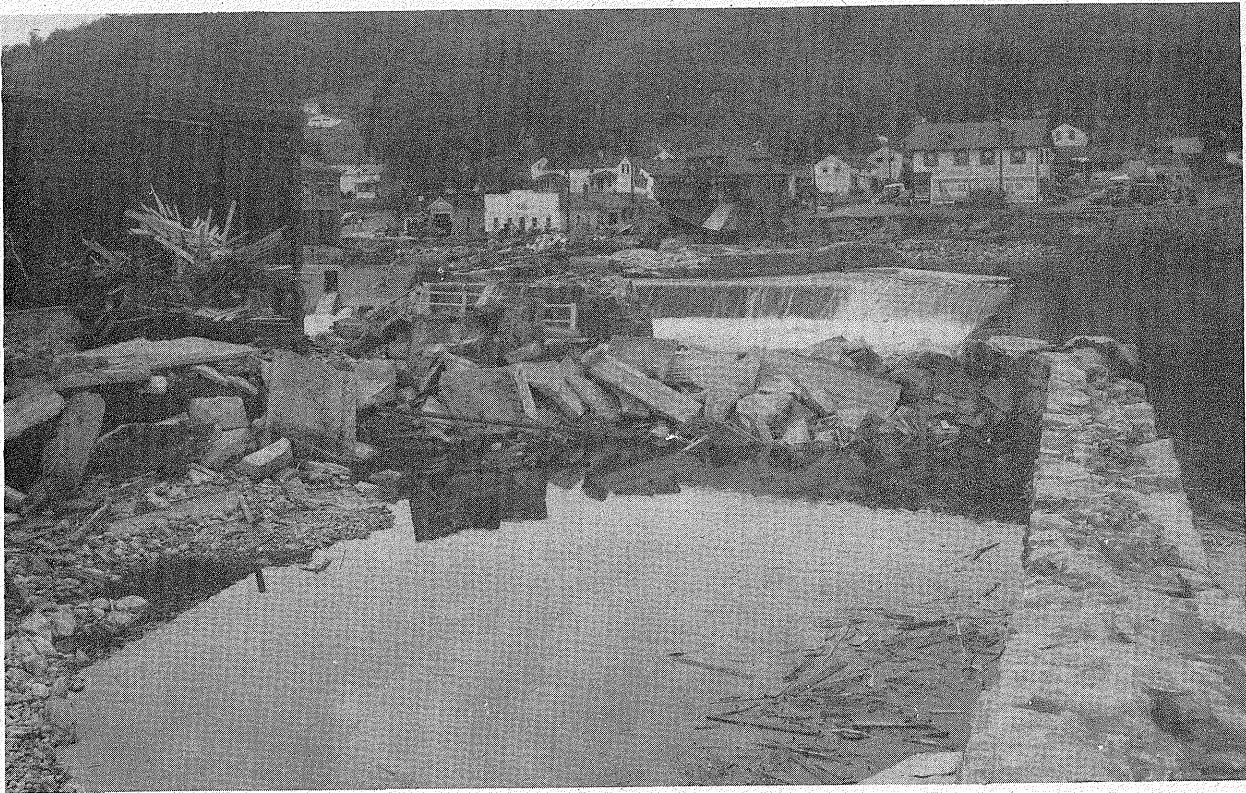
A.—Farmington River at Collinsville, Conn. Site of bridge failure and local power dam.
